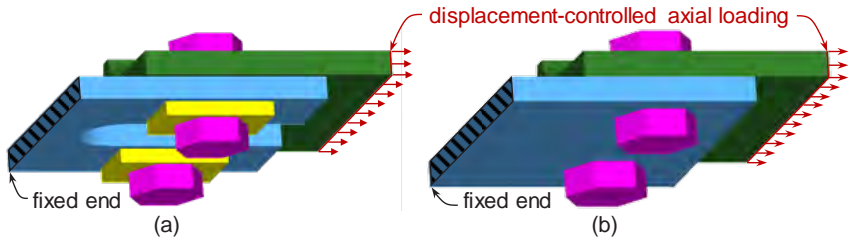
Component-level analysis models: (a) U-shaped plate with long-slotted holes; (b) rectangular plate with standard holes.
